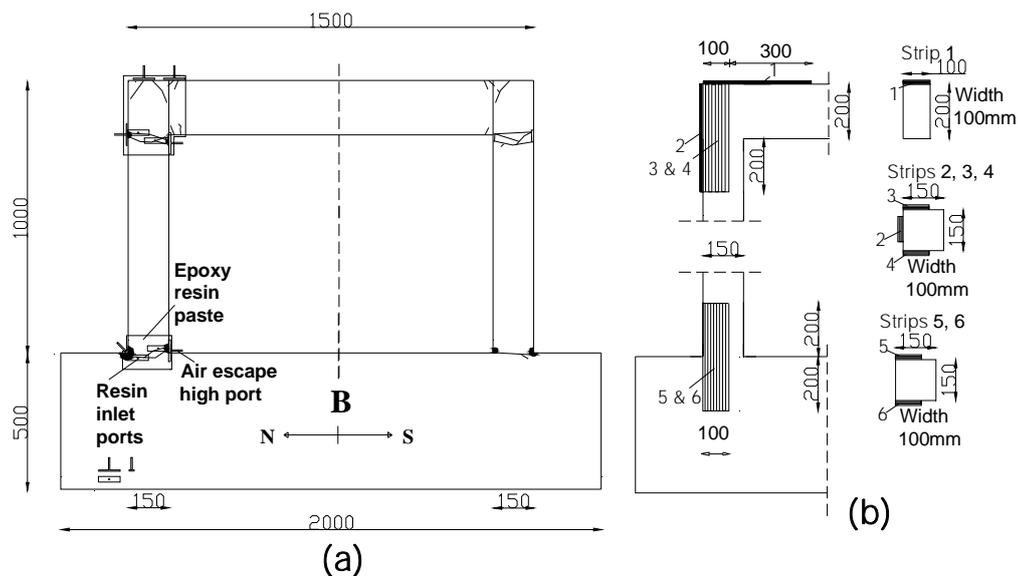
(a) Application of epoxy injections; (b) arrangement and location of CFRP strips in Specimen B (units in mm)
